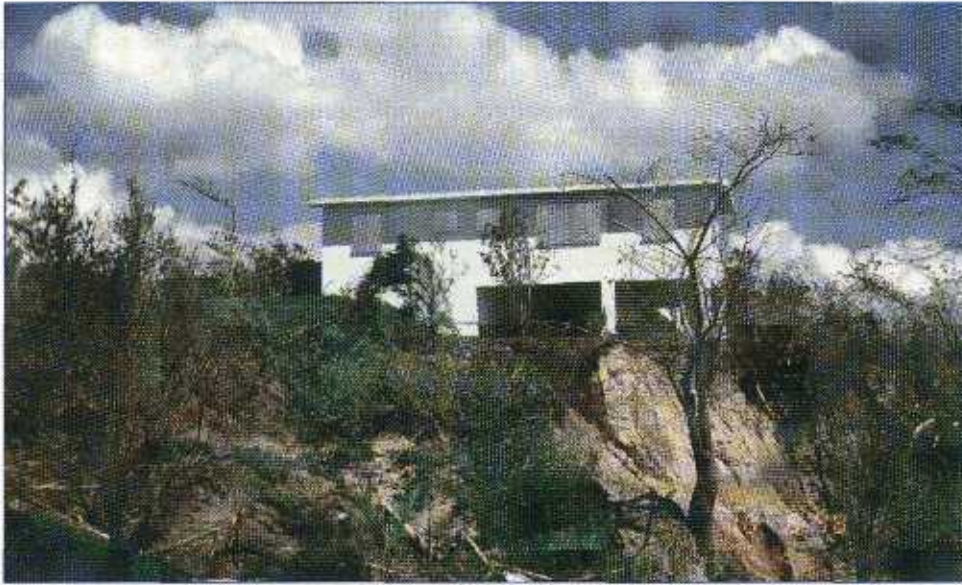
Residential home constructed of reinforced concrete and masonry with a reinforced concrete roof deck in the mountains outside Adjuntas.
